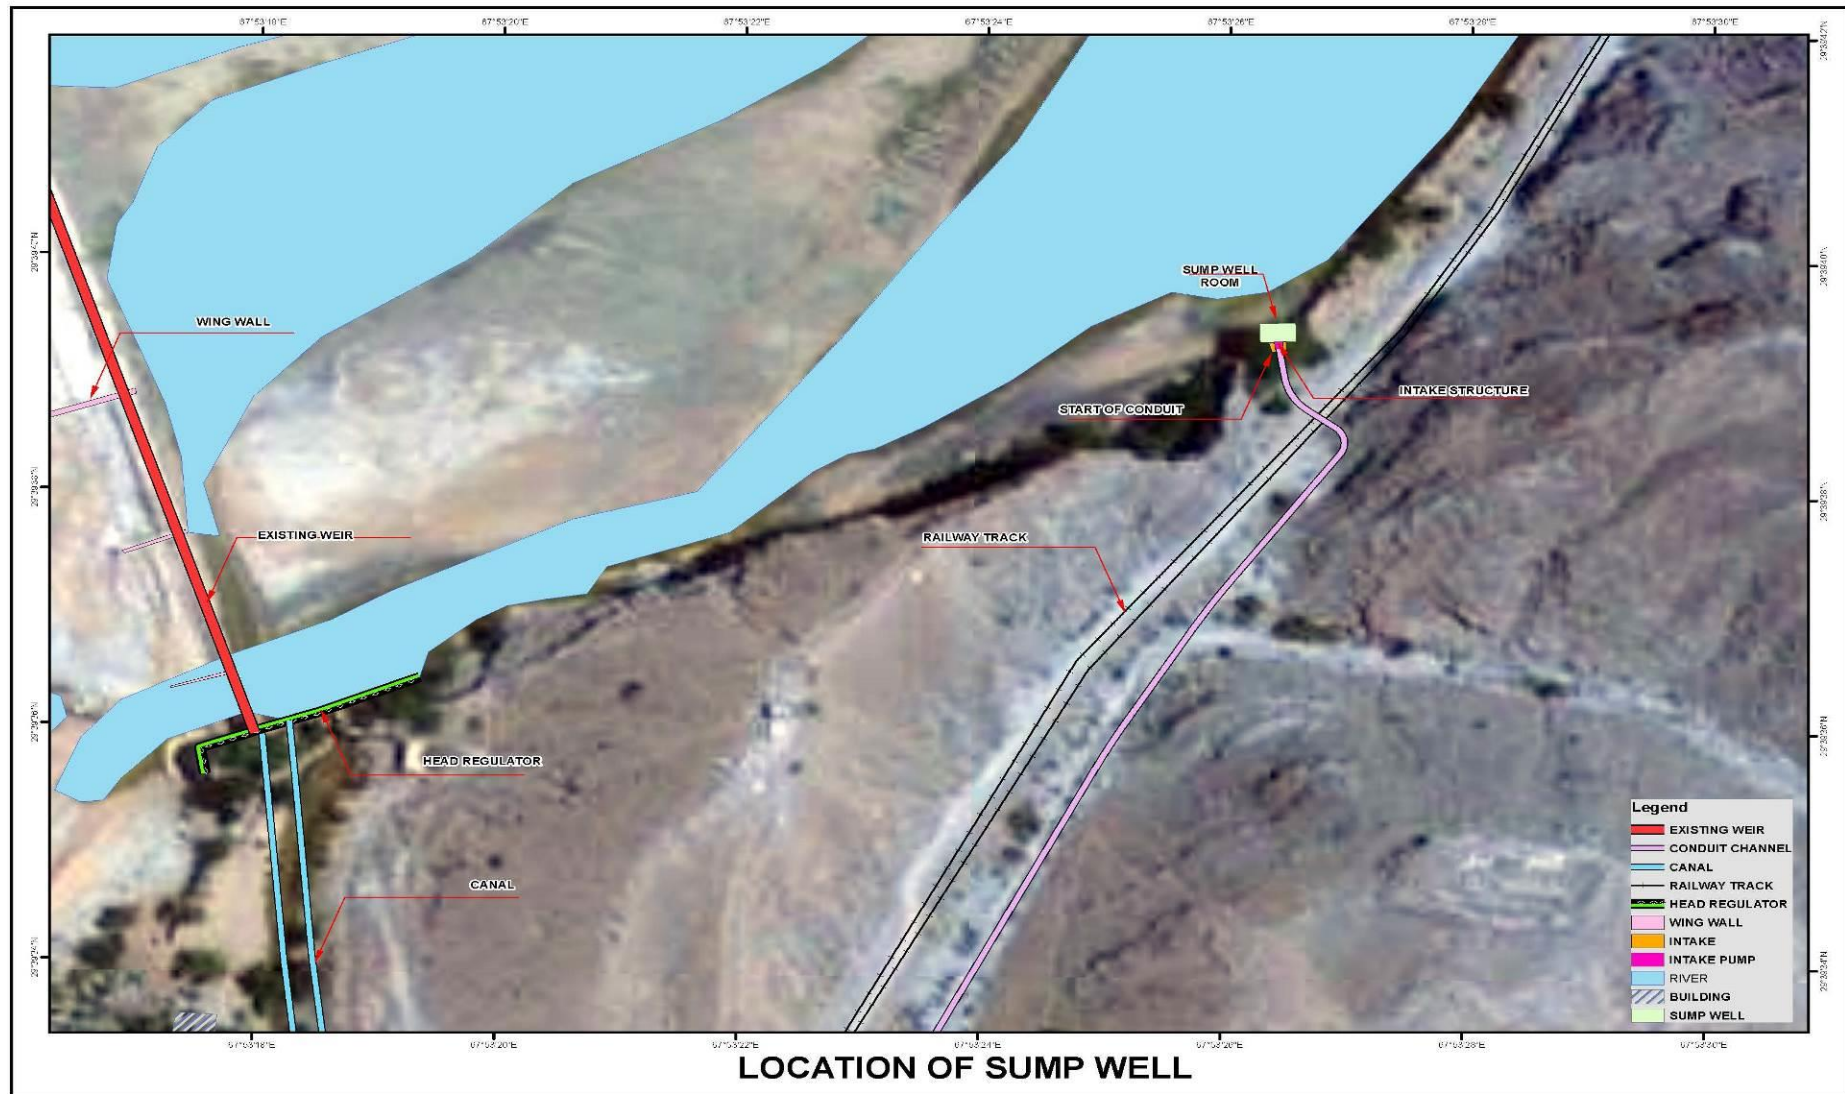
Location Plan and Conduit Layout Sibi Water Supply Scheme
